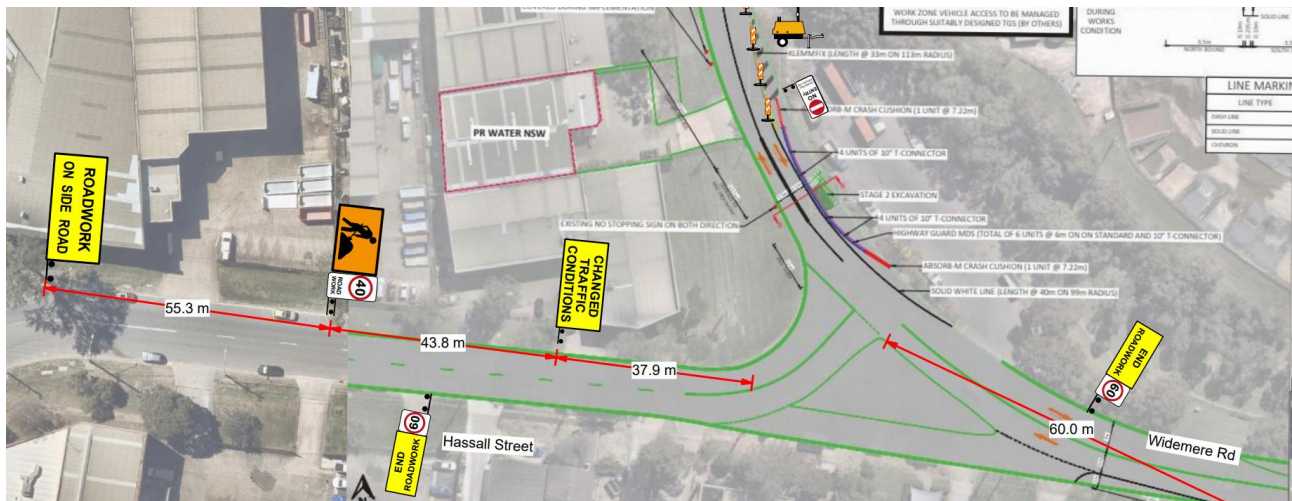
Proposed temporary traffic layout at Widemere Road (Stage 2).
